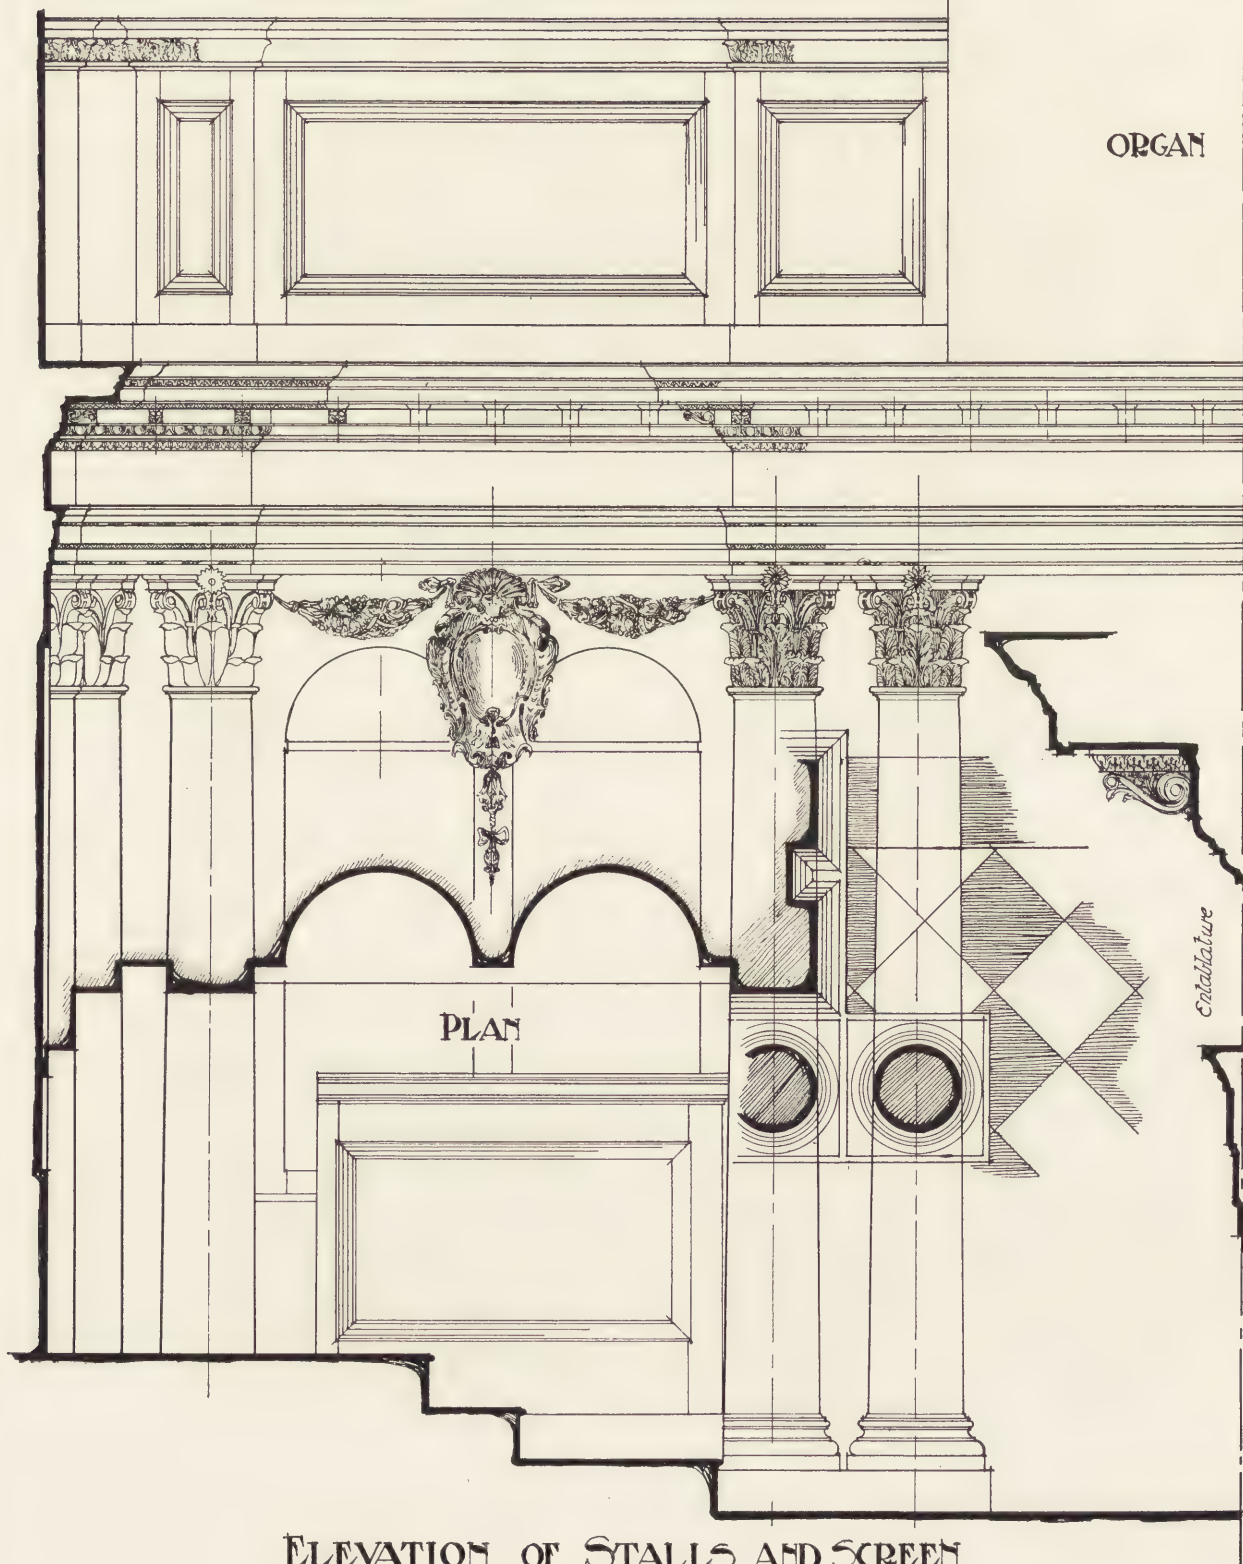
DETAIL OF WOODWORK IN PEMBROKE COLLEGE CHAPEL, CAMBRIDGE.
